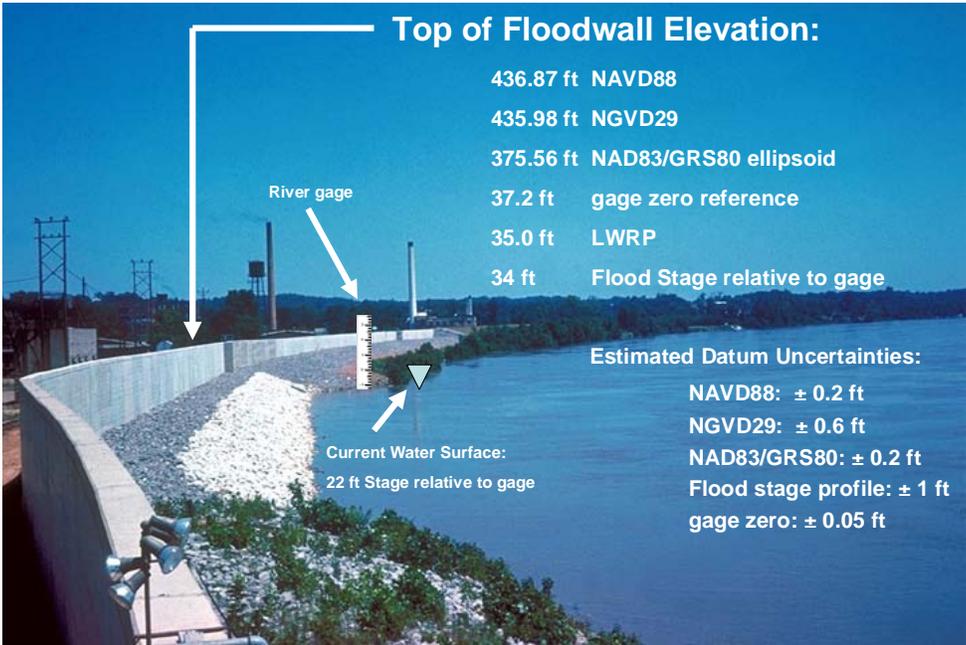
Datum and elevation uncertainties on an inland river system floodwall protection height. The reference datum uncertainties propagate to an uncertainty in the floodwall elevation. (see Chapter 9).
